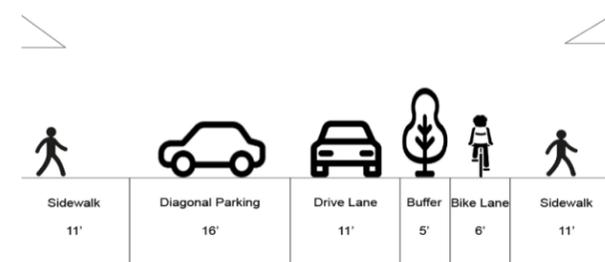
Illustration of Option A: 4th Street as a one-way street. This ROW would use the full width of the street and include wide sidewalks, diagonal parking spaces, a one-way driving lane, and a buffer between the car and bike lane.
